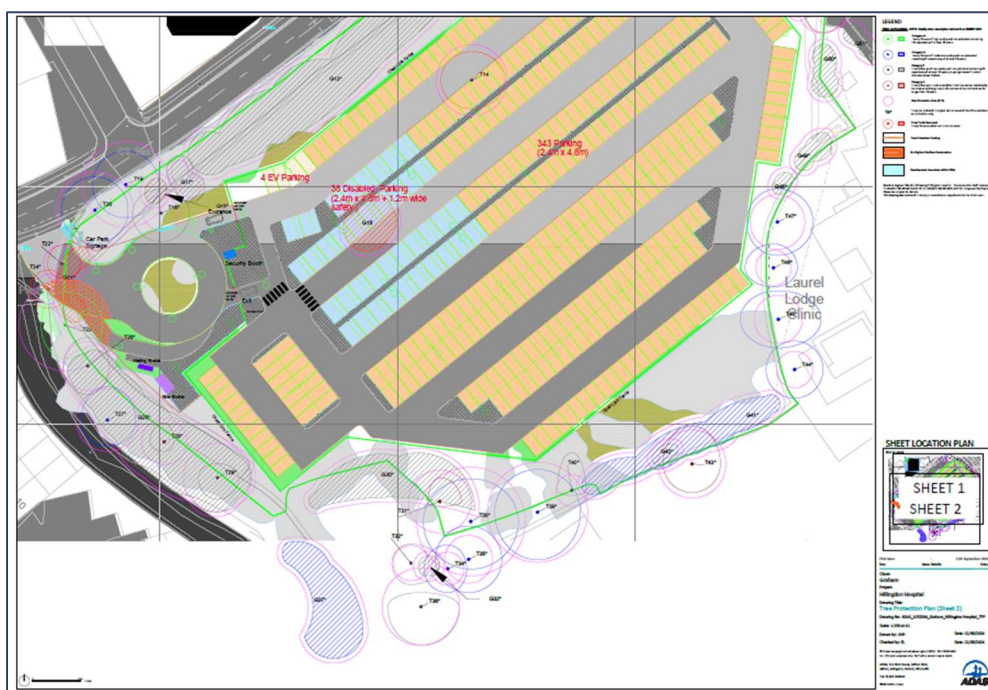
Tree Protection Plan (Sheet 2) showing the location of tree protection fencing and no dig hard surface construction areas
